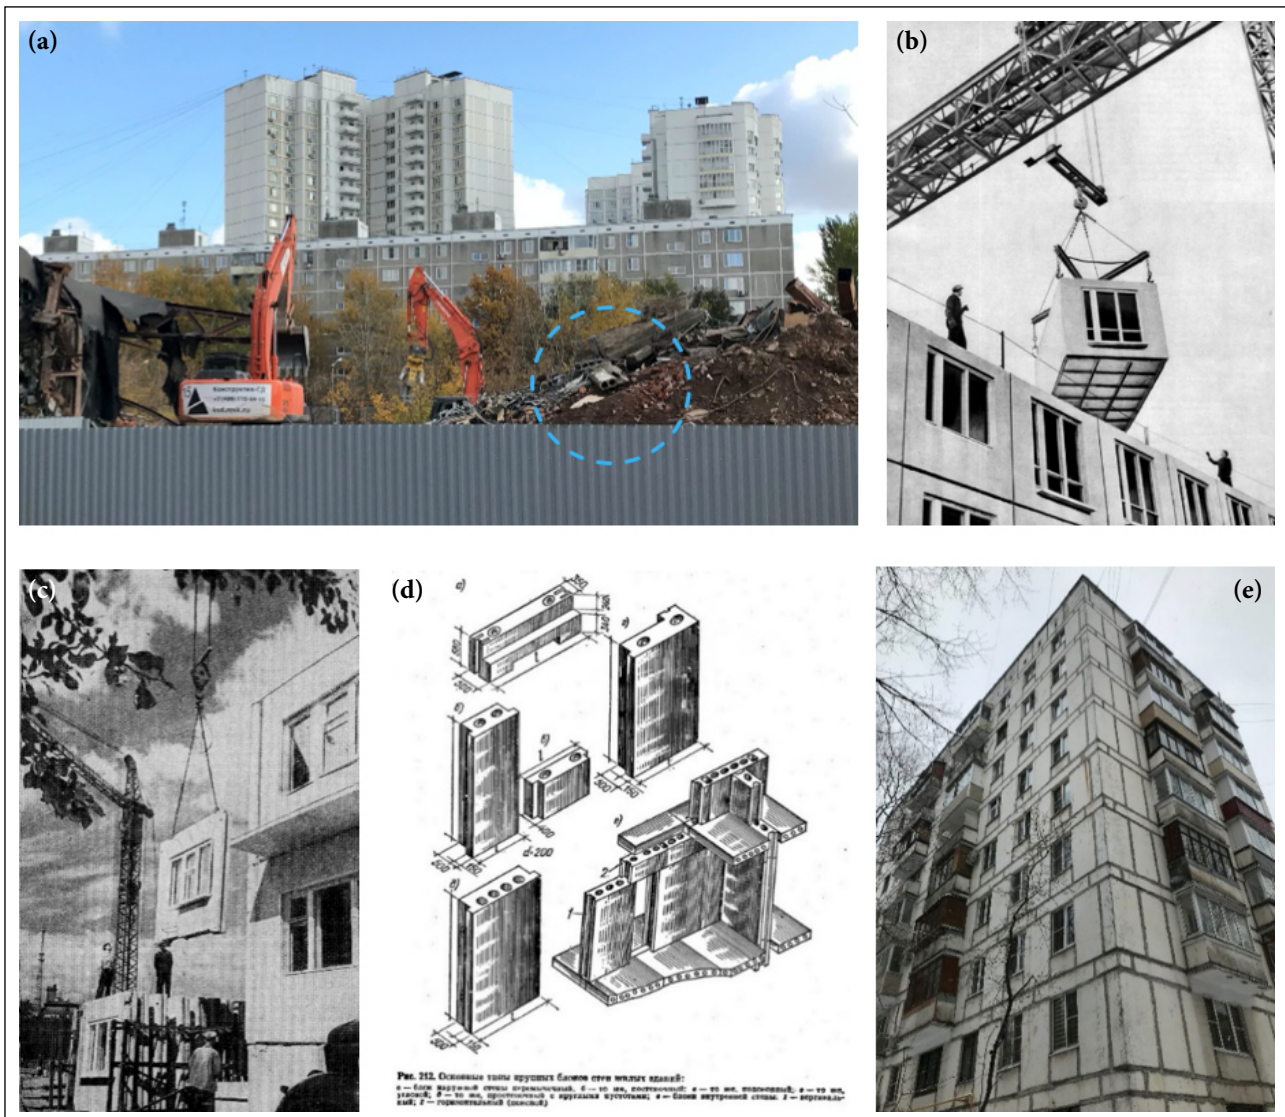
(a) The precast slab panels of the Vityaz Movie Theatre were captured during demolition. (b) Assembly of a residential building from prefabricated rooms in 1964 [41]. (c) Precast walls during construction in the 1970s [42]. (d) Assembly schema of precast wall panels and slab panels [38]. (e) A building was constructed using precast wall panels and slab panels in Moscow in the 1970s.
